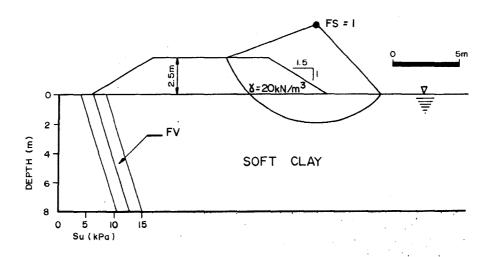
Case 3 - Railway embankment failure near Sao Luis
